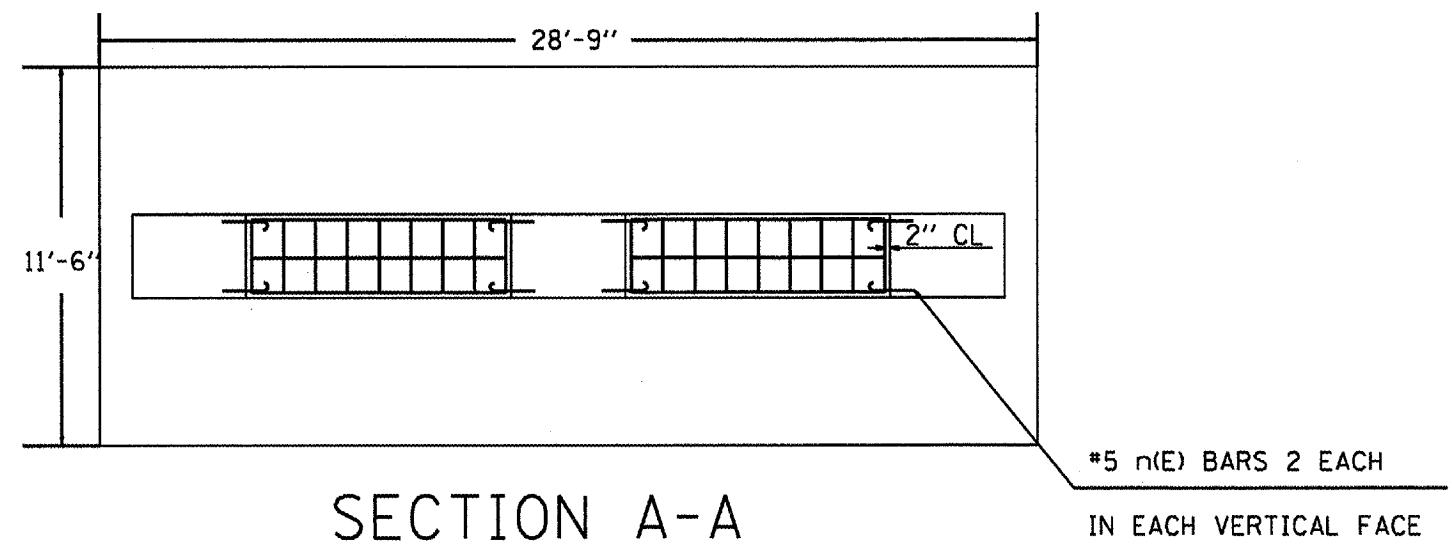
# DETAIL OF PIER IMPROVEMENTS AT SN 044-0035
